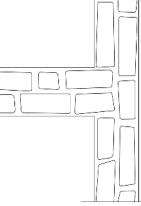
Inner-outer wall with poor connection Figure 24b: Connection details of outer wall with inner wall
